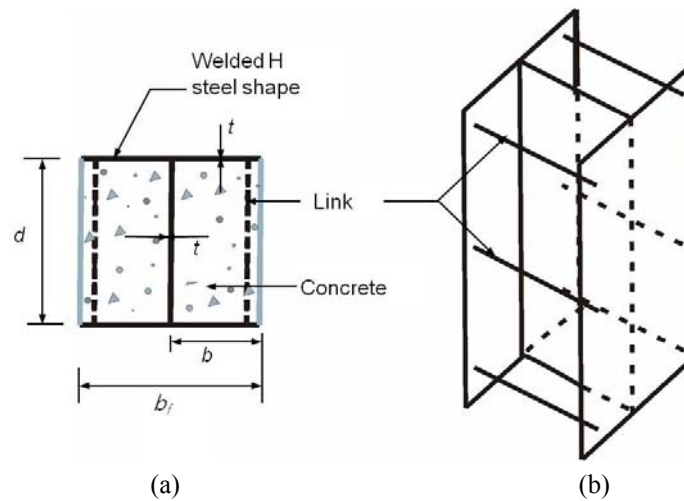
Partially encased composite column with thin-walled built-up steel section, (a) column cross-section and (b) 3d view of the steel configuration
